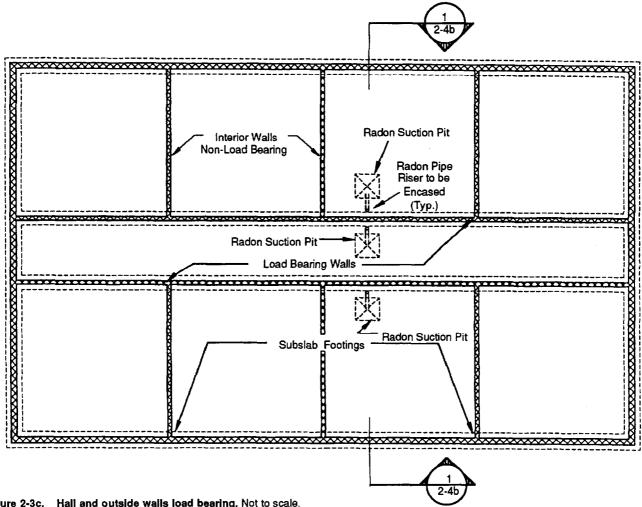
Hall and outside walls load bearing. Not to scale.
